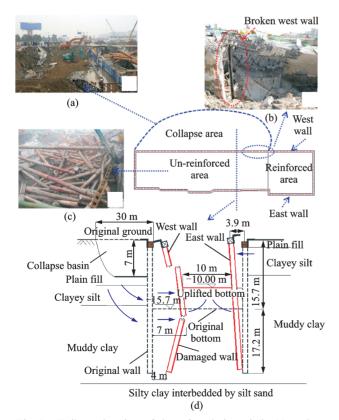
Failure situation of deep foundation pit in Hangzhou Metro Line 4
